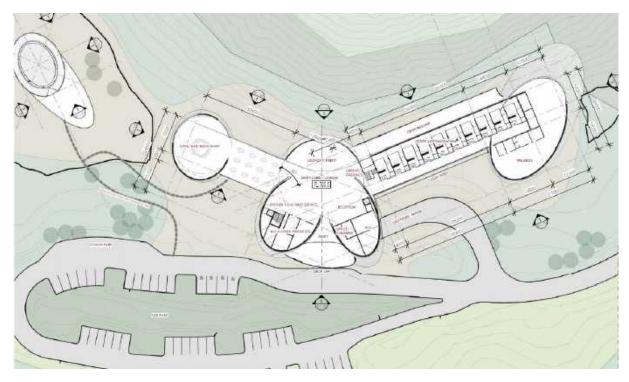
Lodge and Chapel Buildings Floor Plan. TOA Architects Ltd.
